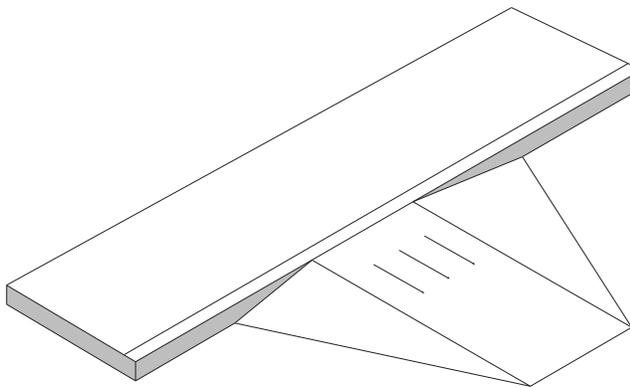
Components of a Curb Ramp. Source: CUUATS Sidewalk Network Inventory
